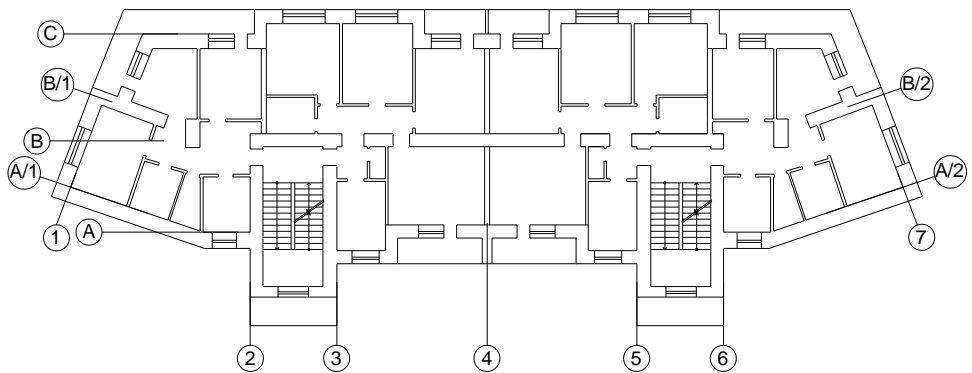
The layout of an eight-storey section of a multi-storey residential building
